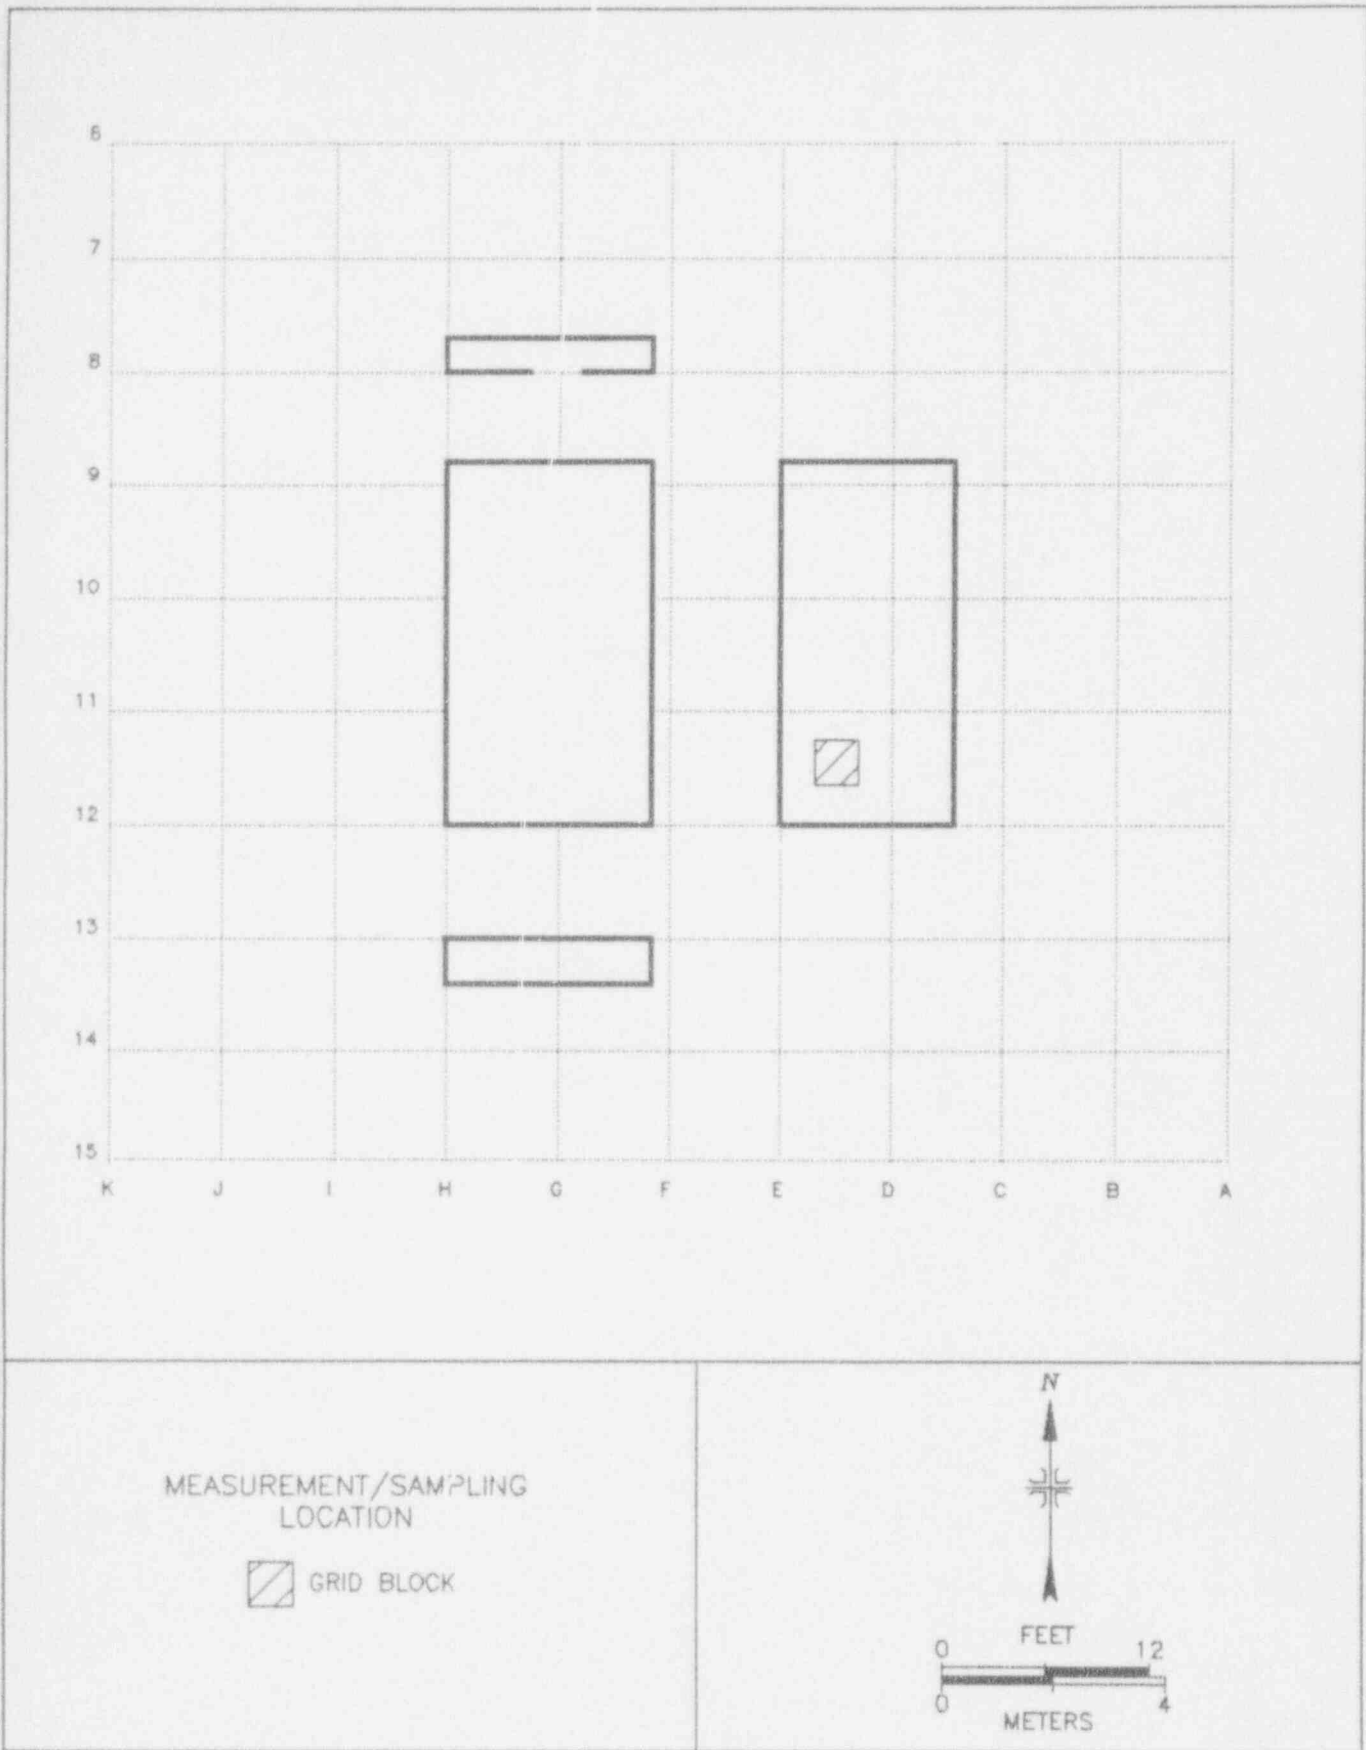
Unit 1 Control Room, Upper Walls – Measurement and Sampling Location.
